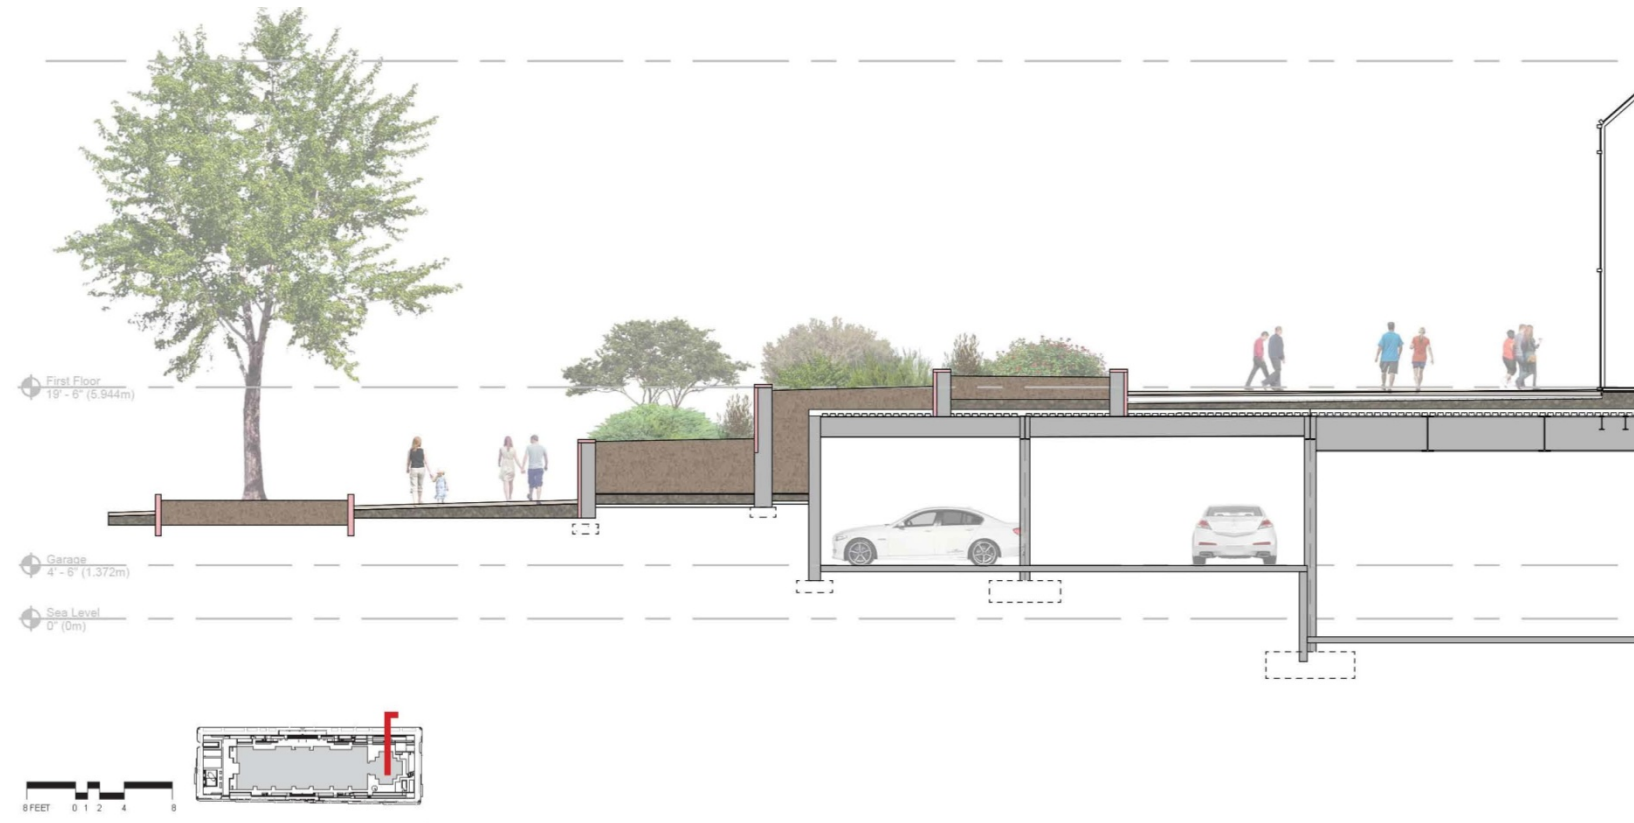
Existing Typical Planter Section. (Source: AECOM.)
